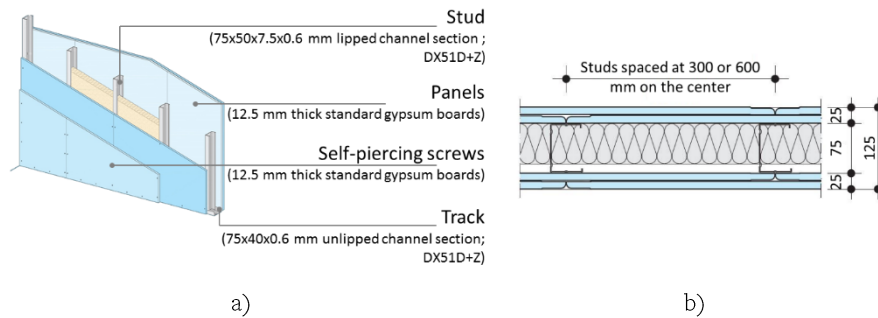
Typical metal stud partition wall: a) assembly and stratification; b) horizontal section
